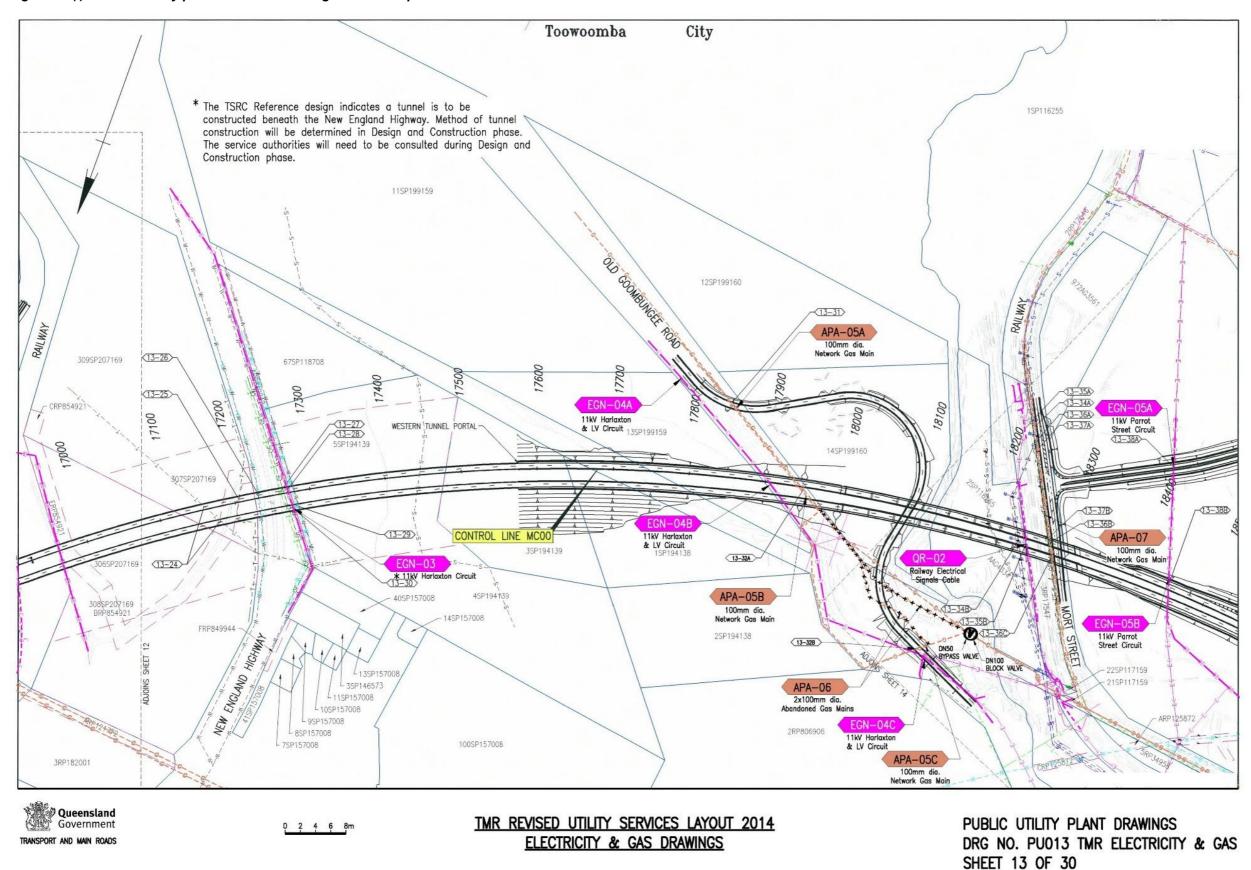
(m) – Public utility plant – Conflict Plans generic example – sheet 9 of 11
